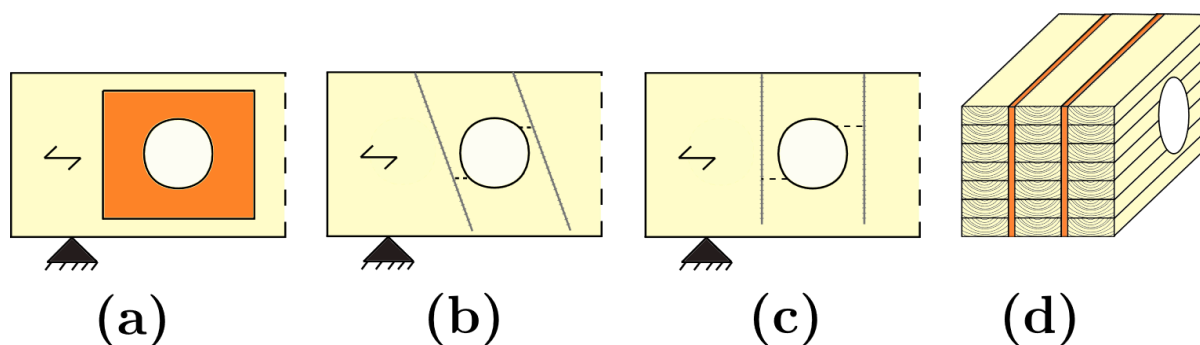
(a) glued-on-plane reinforcement, (b-c) fully threaded self-drilling screws or glued-in steel rods vertically and with an inclination. Notice that cracks can still occur between the hole and screws. (d) internal, vertical glued-on reinforcement (e.g., LVL) between layers of glulam.
